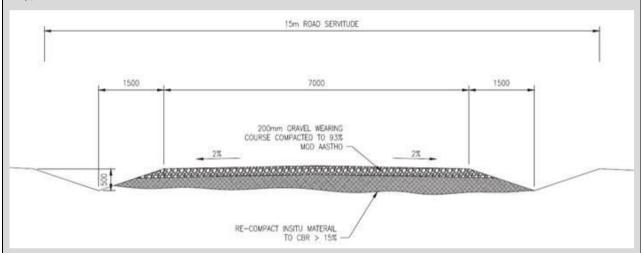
Typical cross section of the proposed Kenhardt Access Road
